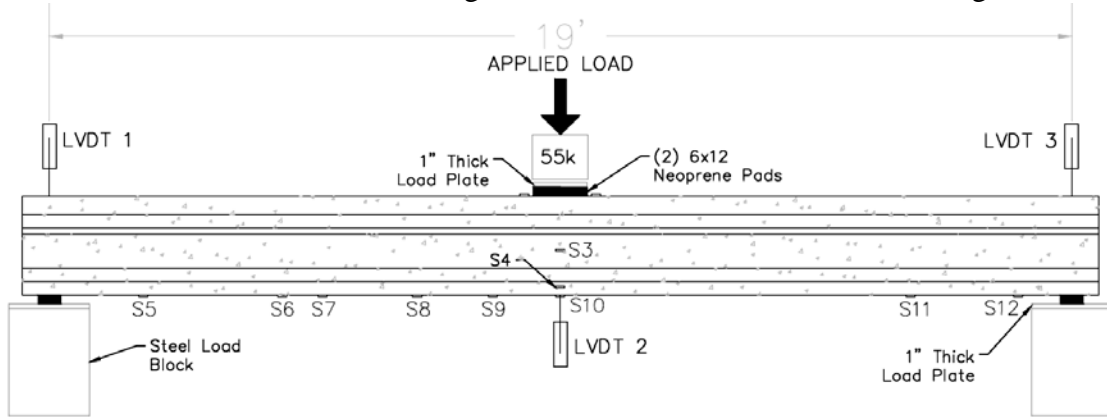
Fatigue loading setup arrangement for half-scaled AASHTO PSC girders
